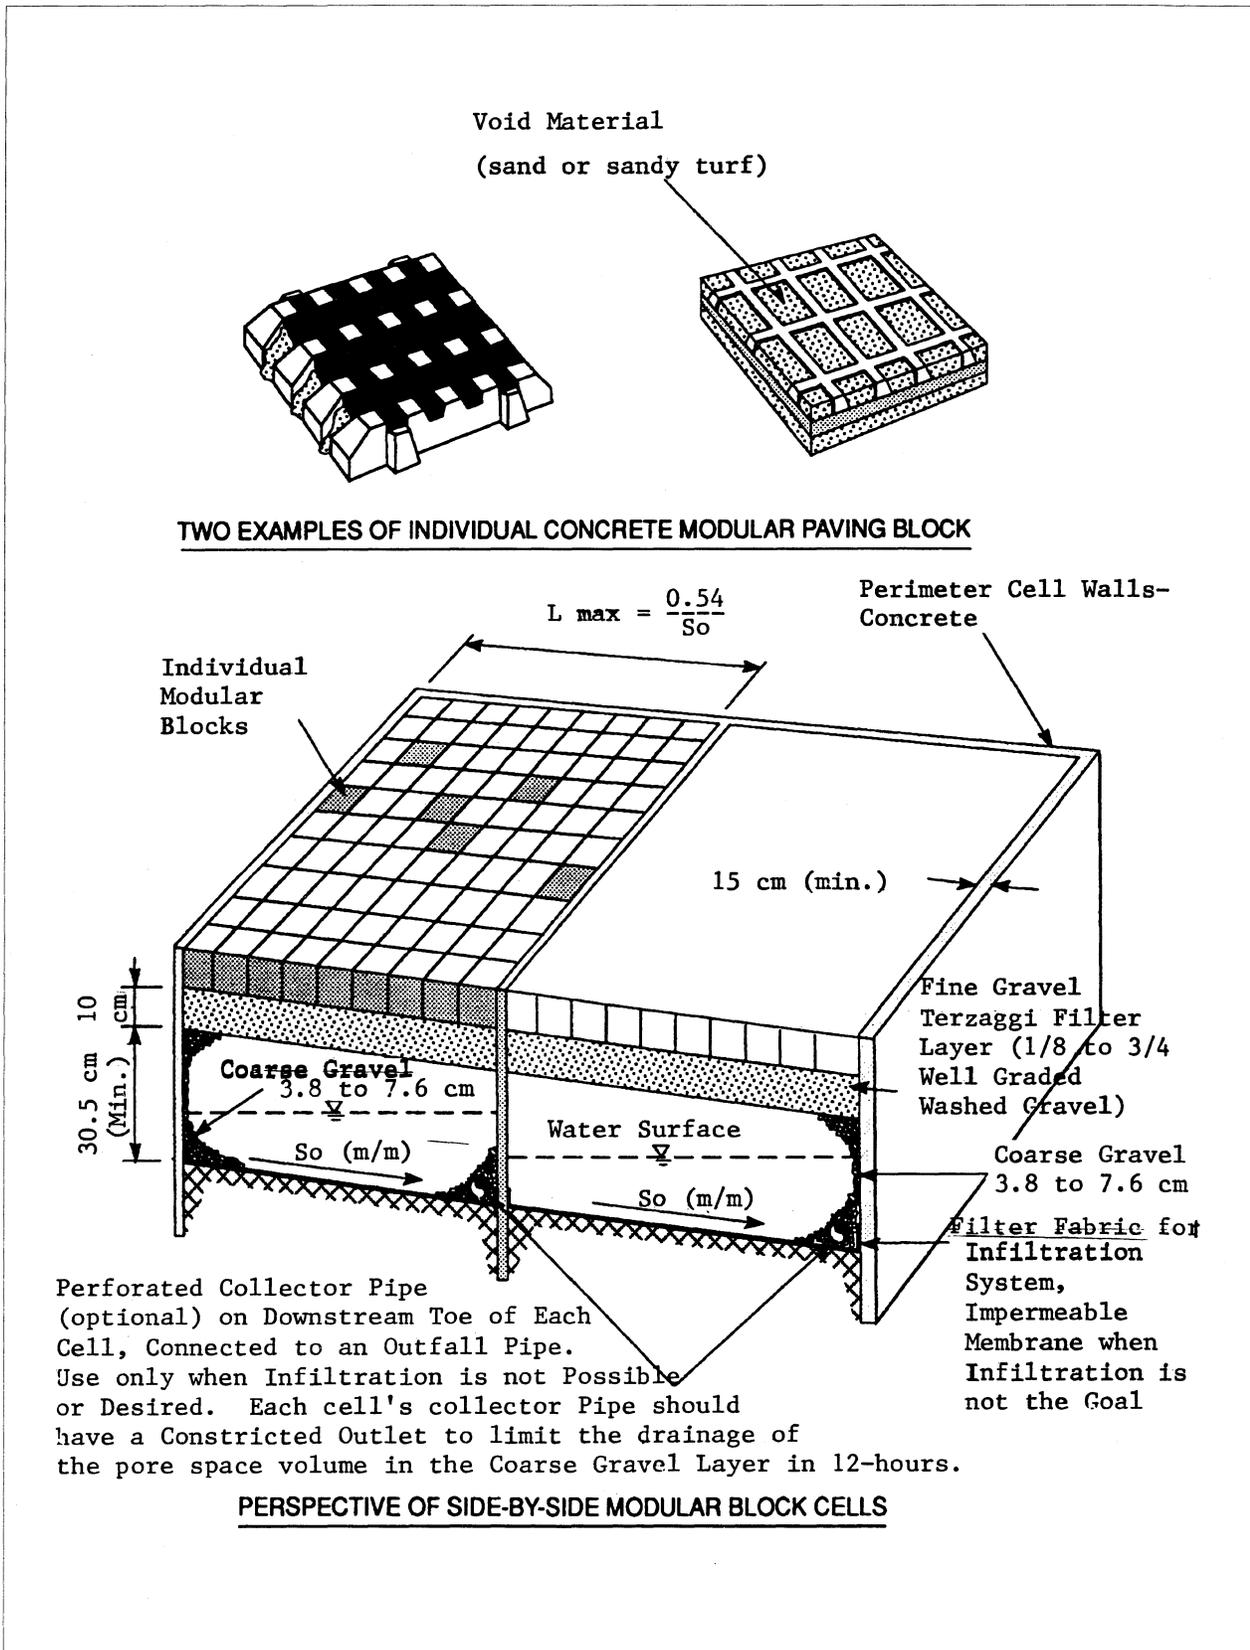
Schematic of typical porous pavement section (Young et al., 1996)
